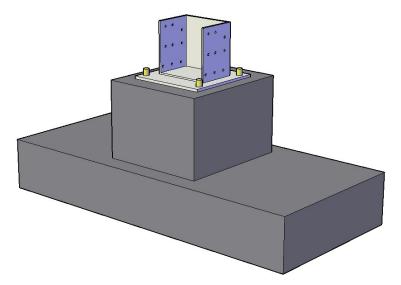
3D drawing of foundation for Hempcrete noise barrier. Basic view.
